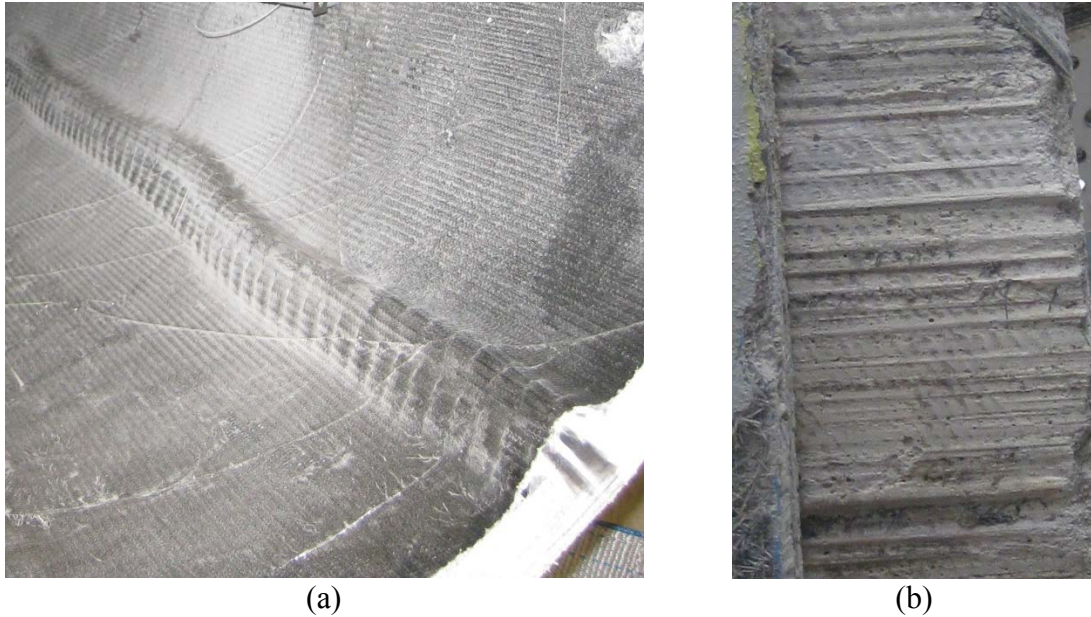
Ridges inside FRP Shell (a) and Impressions on Concrete (b)
